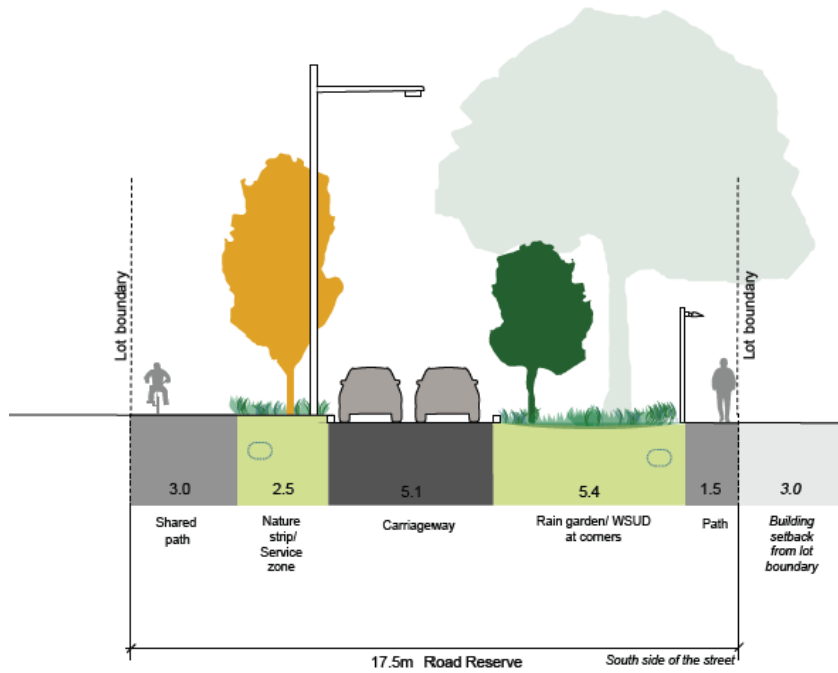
East West Street with raingardens dispersed at east street corner and centre of block
